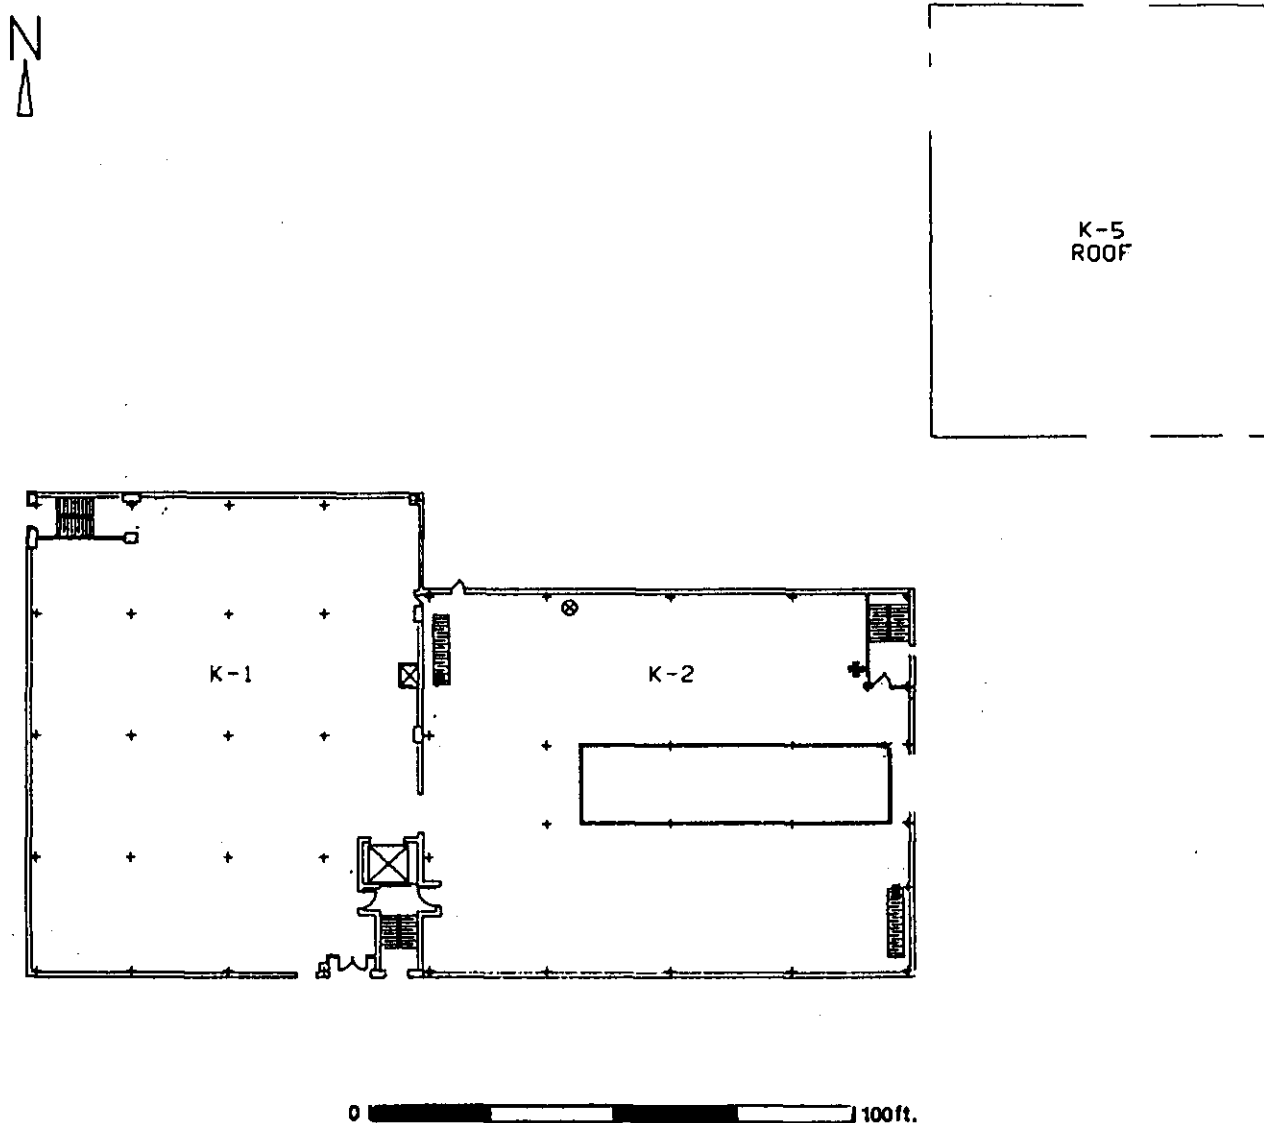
SECOND FLOOR LEVELS OF K-1 AND K-2, AND K-5 ROOF
